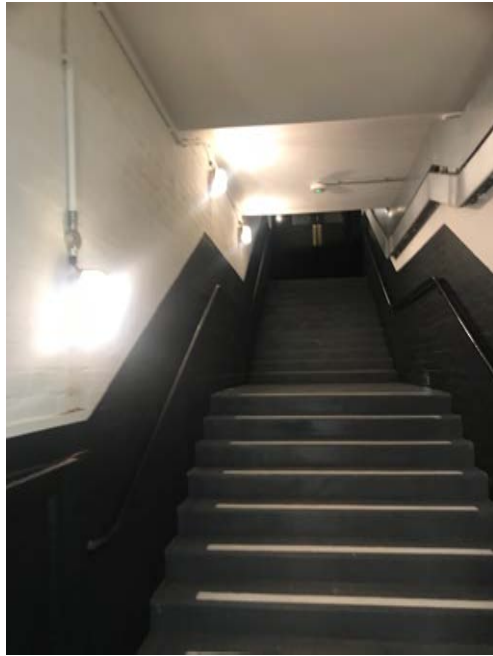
Escape stair shown here with electrical tray on the right shown on the sketch as pink route.
